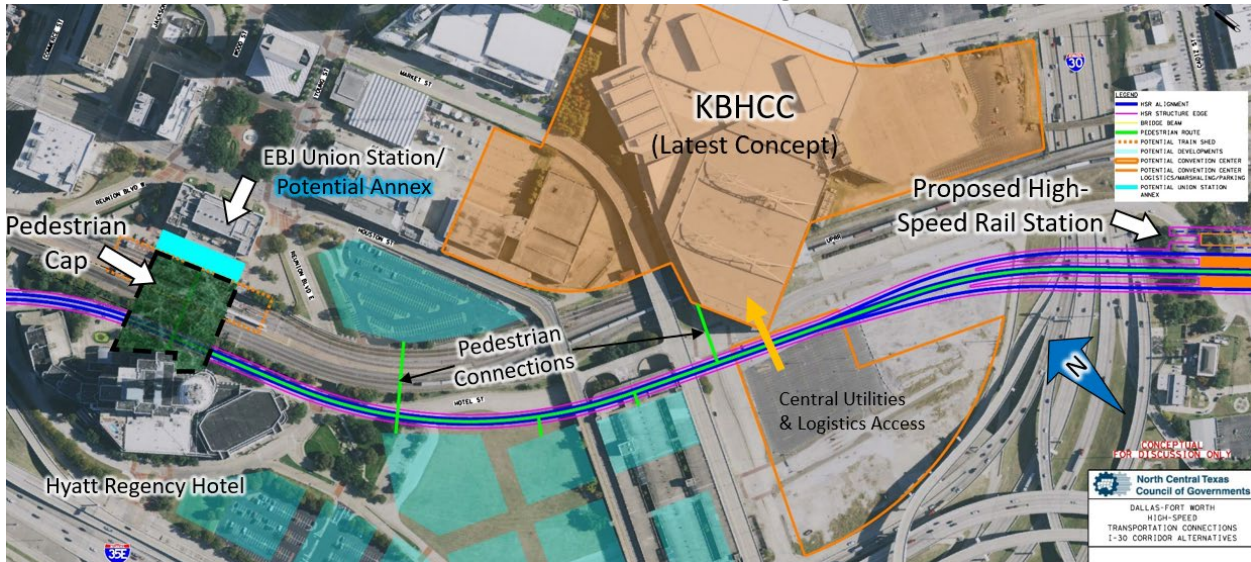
Plan View of Potential Pedestrian Way Connections
